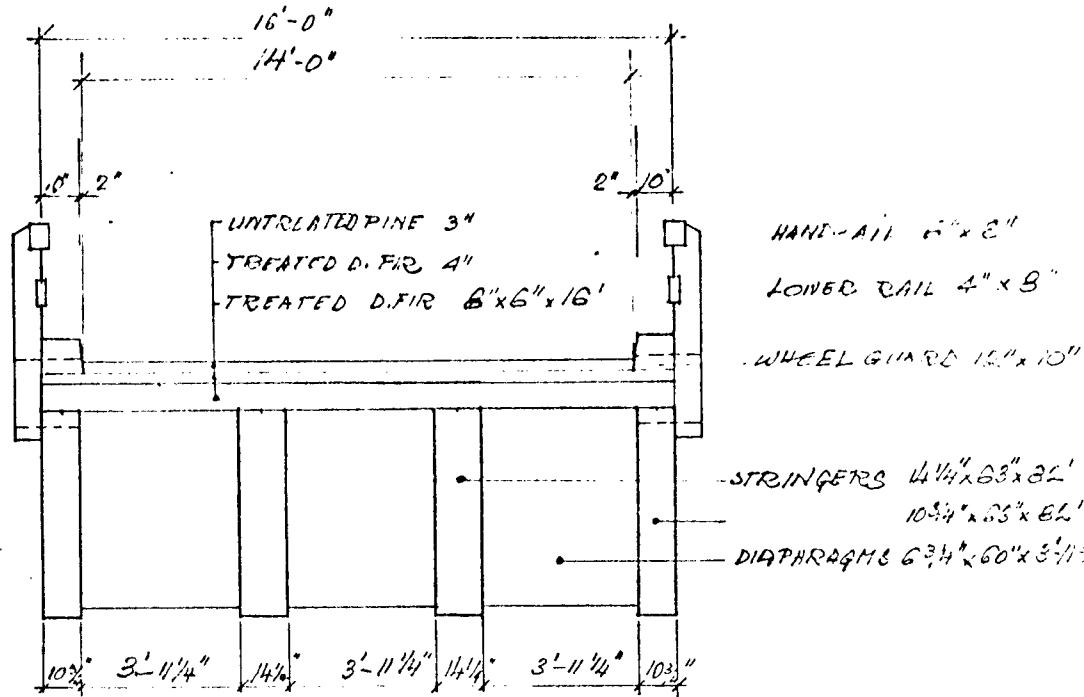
Arrangement of roadway with wheel guards and guardrails.
